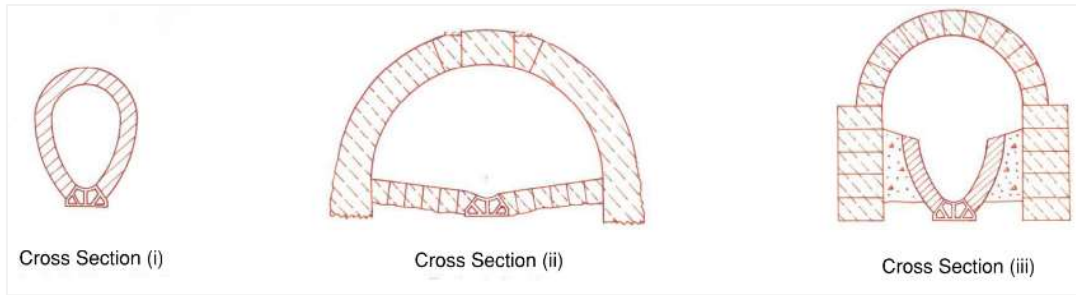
Tank Stream – Typical Cross Section Profiles. Source: Sydney Water
